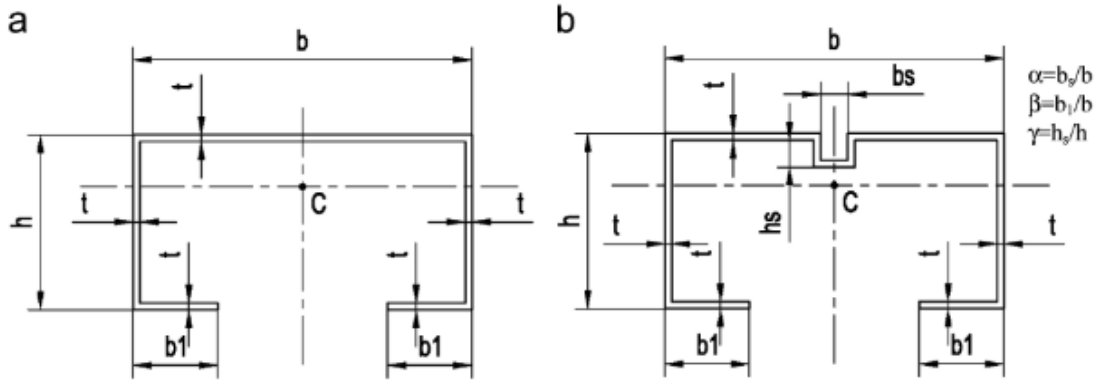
Lipped channel section (a) without web stiffener (b) with web stiffener (Nguyen & Kim, 2009)
